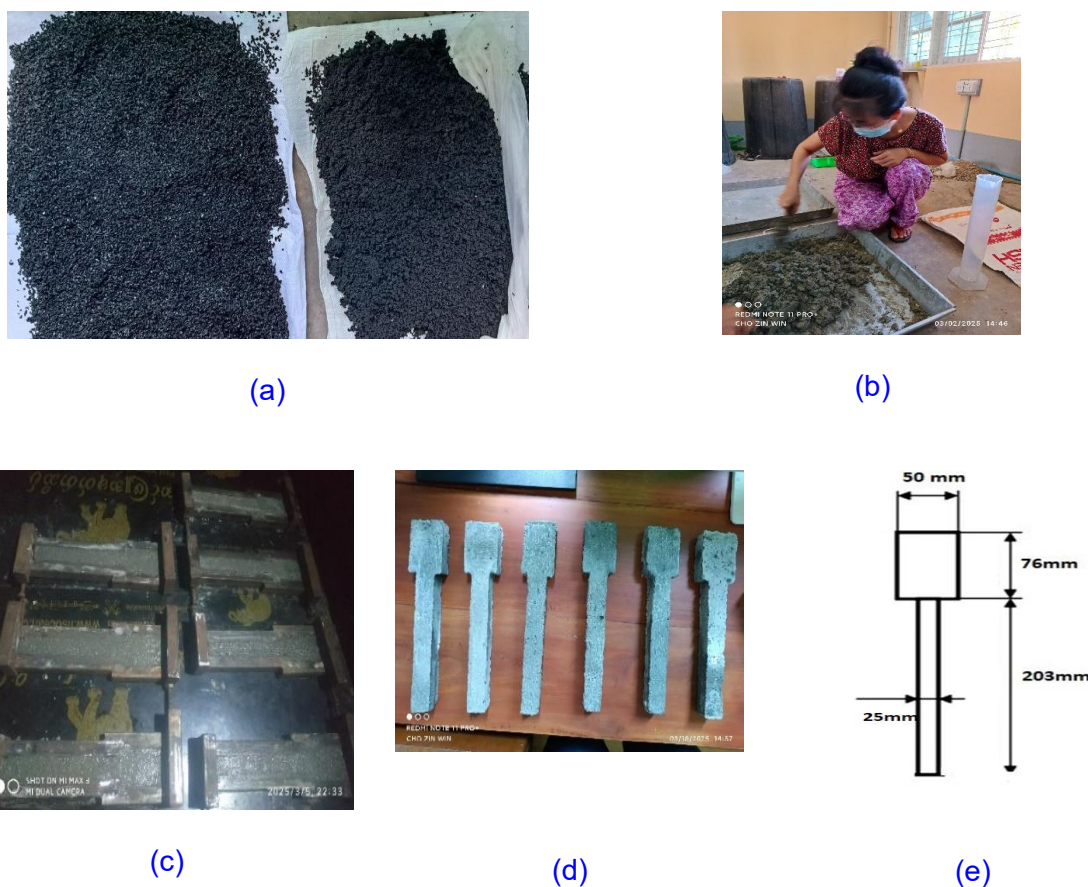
Process of rubberized concrete production (a) drying CH₃COOH treated crumb until SSD condition after washing with water (b) mixing concrete (c) placing concrete (d) normal and rubberized concrete specimens (e) size of specimen
